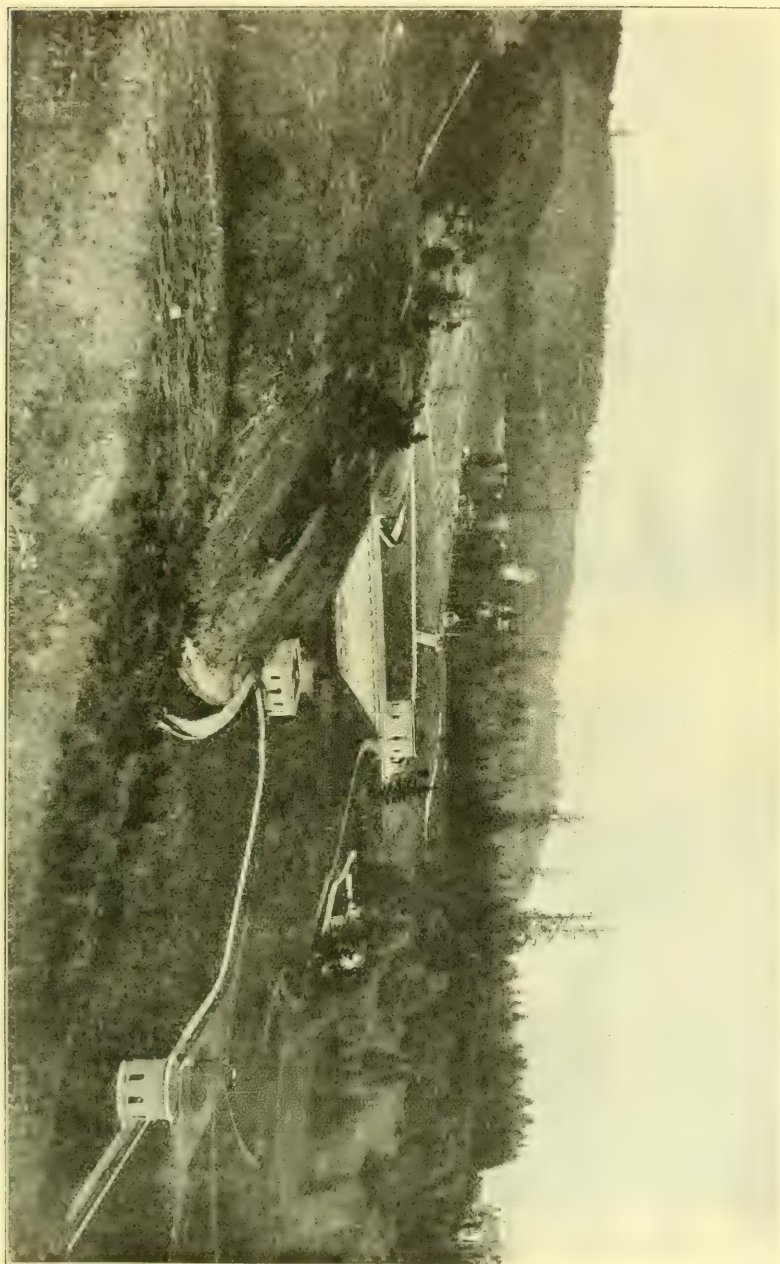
RESERVOIRS NOS. 3 AND 4, PORTLAND, ORE., BEFORE REPAIRS WERE COMPLETED IN 1904.
